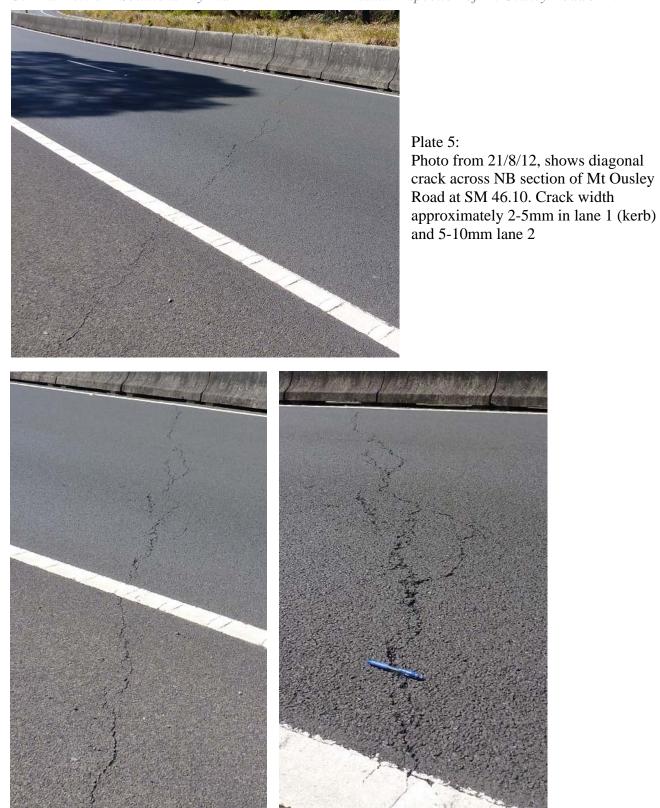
& 6A: Crack across NB pavement 4/9/12 left and 9/10/12 right
